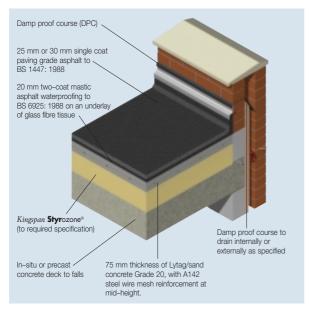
Concrete Slab Finish Parking Decks, Cars and Light Commercial Vehicles (Non HGV) (Maximum Individual Wheel Load – 1 Tonne)
